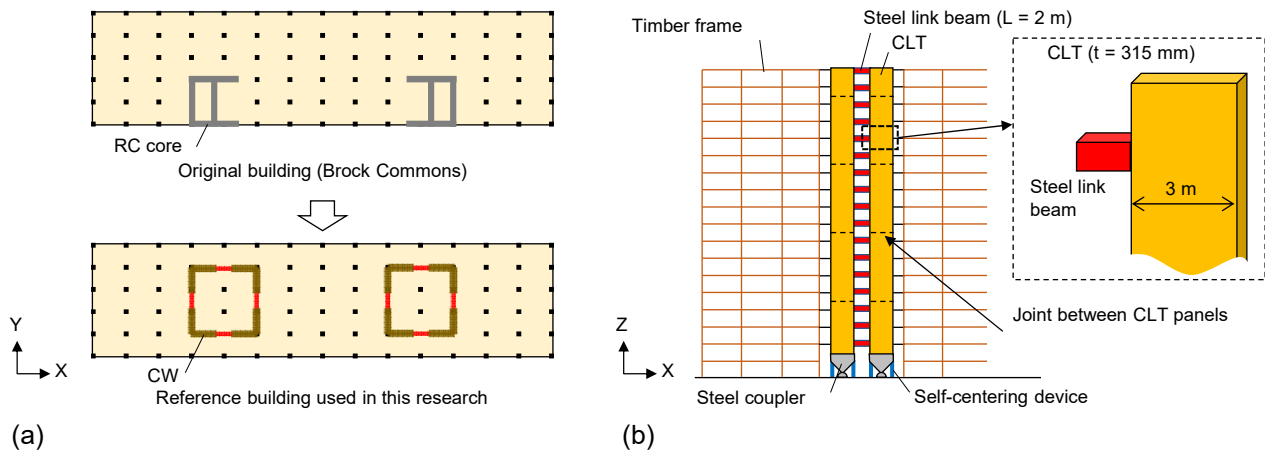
Conceptual drawing of an 18-story timber building with CWs: (a) Plan view, (b) Elevation view.
